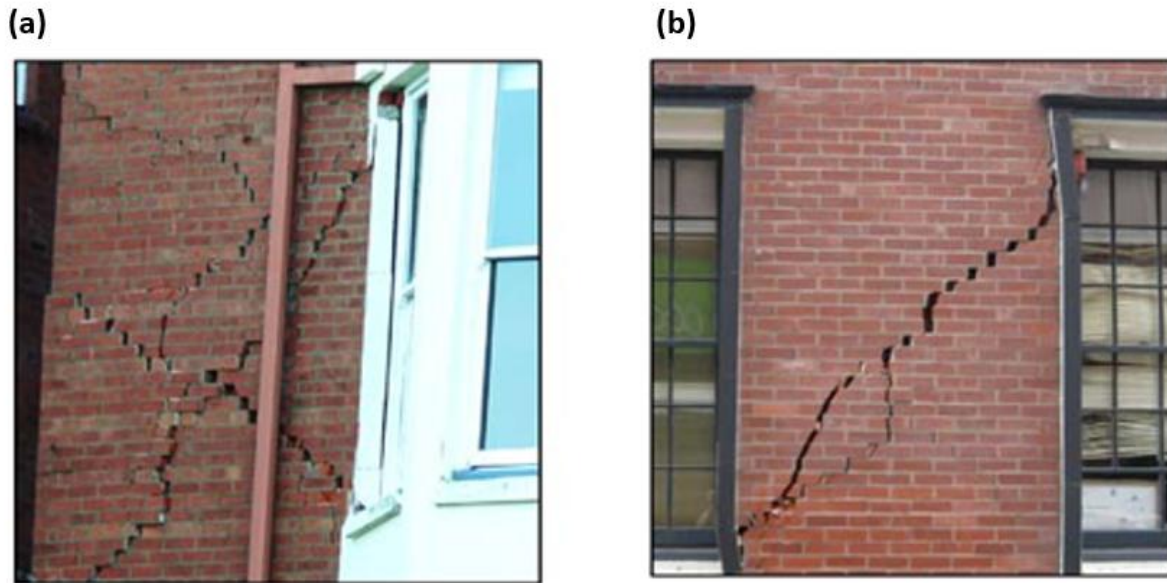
Examples of diagonal shear cracking through (a) mortar joints and (b) through bricks for masonry cavity walls. Adapted by [82].
